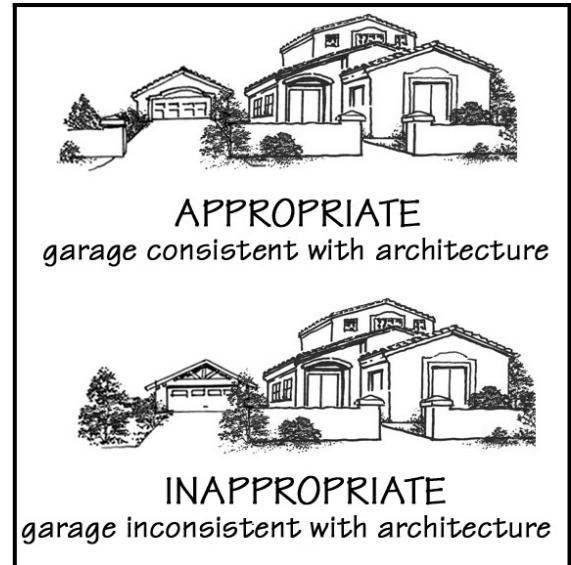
Detached garages should be compatible with the primary structure in design and scale
